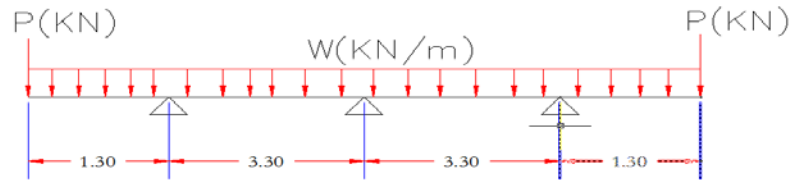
4 Dead loads applied for 1m strip of 20m span one unit of double cell box girder railway bridge deck
